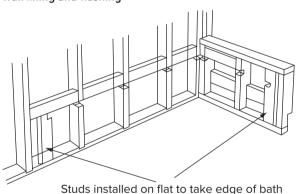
Additional studs installed to accommodate wall lining and flashing
